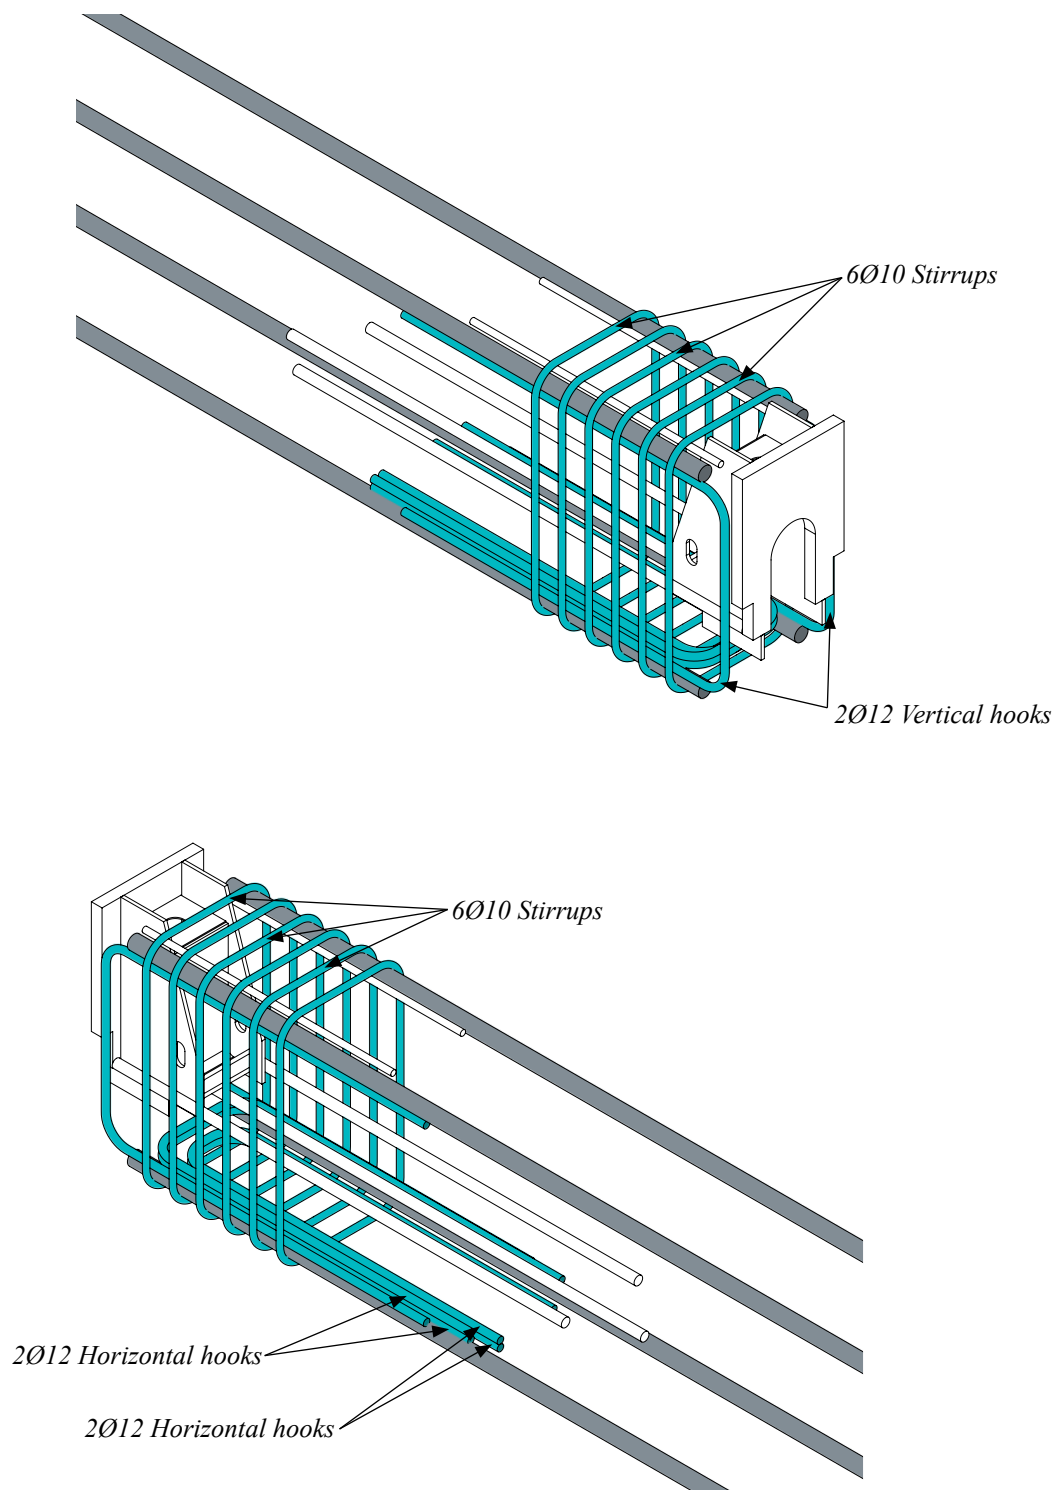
PC 3-H Beam Shoe Supplementary reinforcement.
